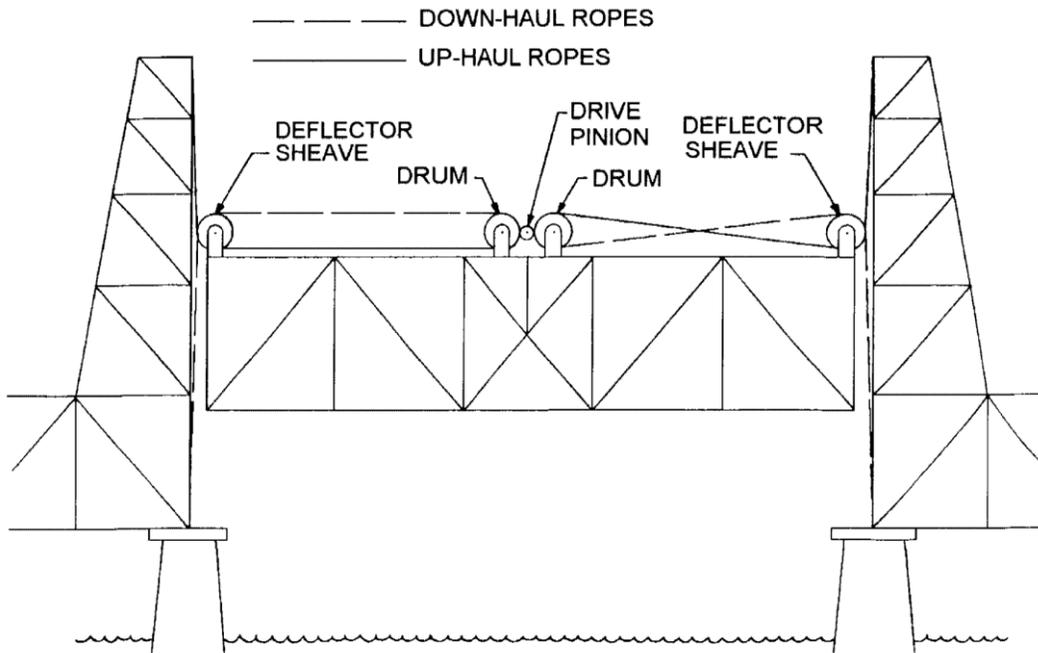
Sketch of operating ropes on a span-drive vertical-lift bridge.
